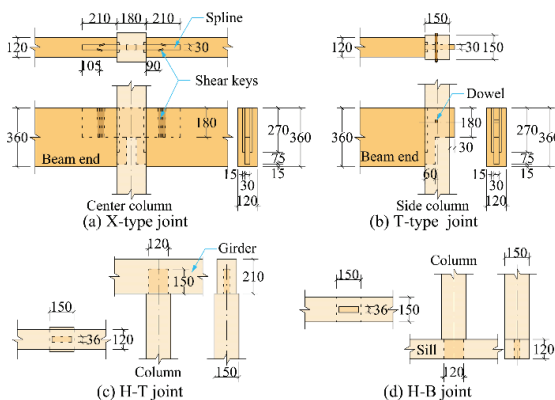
Mortise-tenon joints in frame specimens (Unit: mm).
